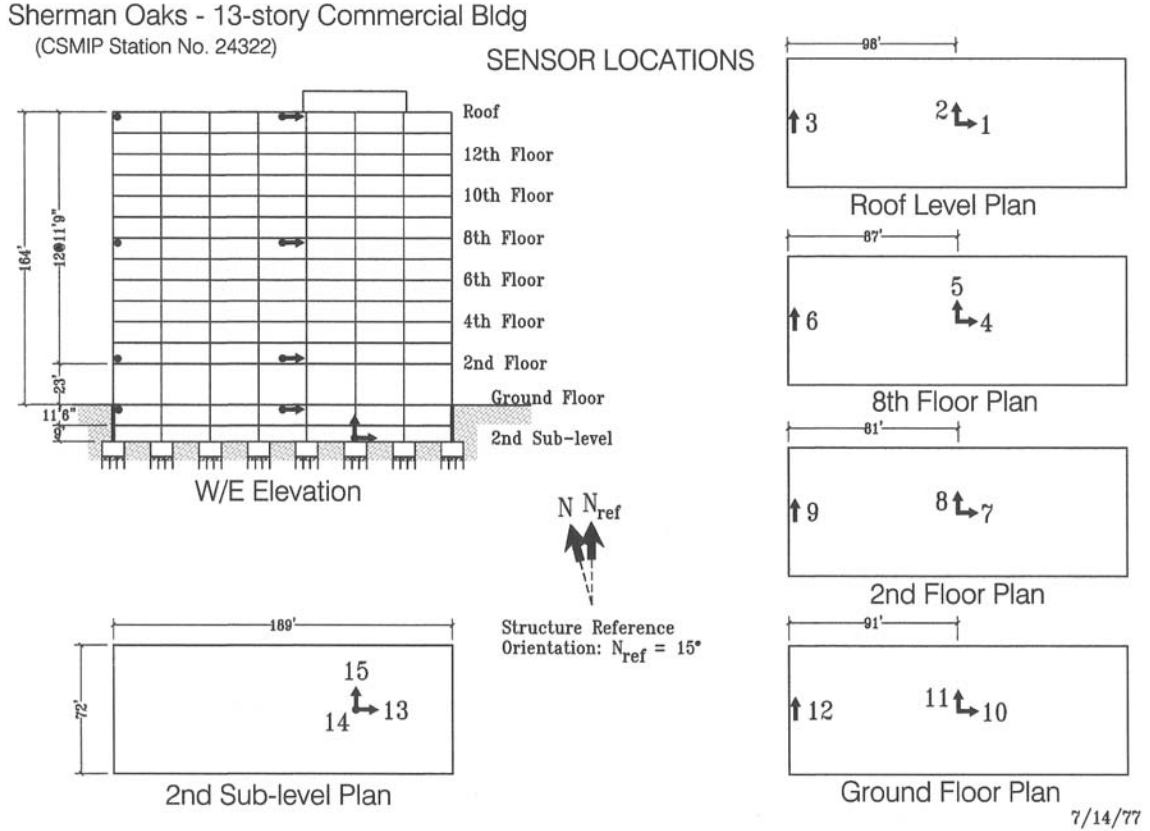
CSMIP Station No. 24322: Sherman Oaks 13-Story commercial building, cross-sectional view and sensor location sketch
